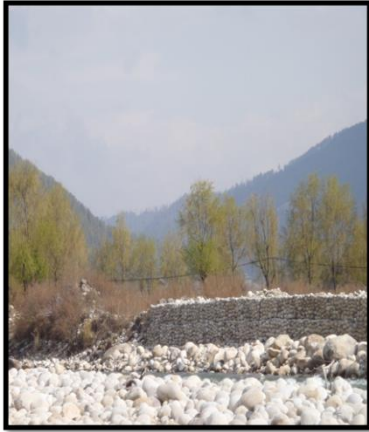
Gabion wall construction of the right bank of Chamkharchu opposite to airport.
